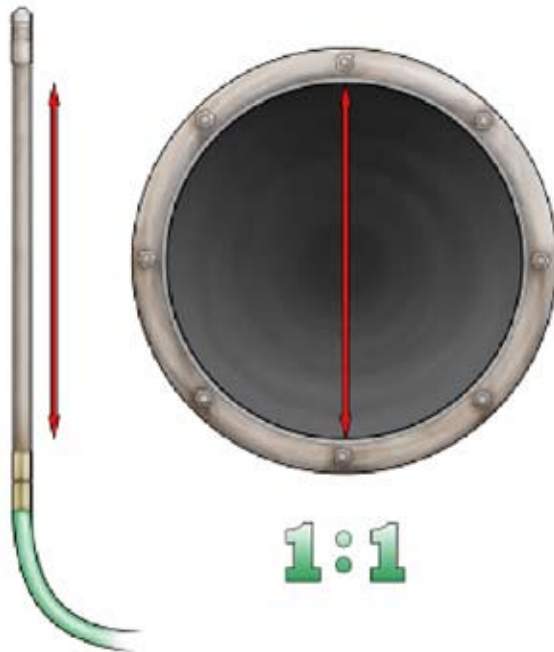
Generally, a stinger with a length equal to the maximum inside diameter of the pipe will prevent the nozzle from turning back on itself inside the pipe (line reversal).
